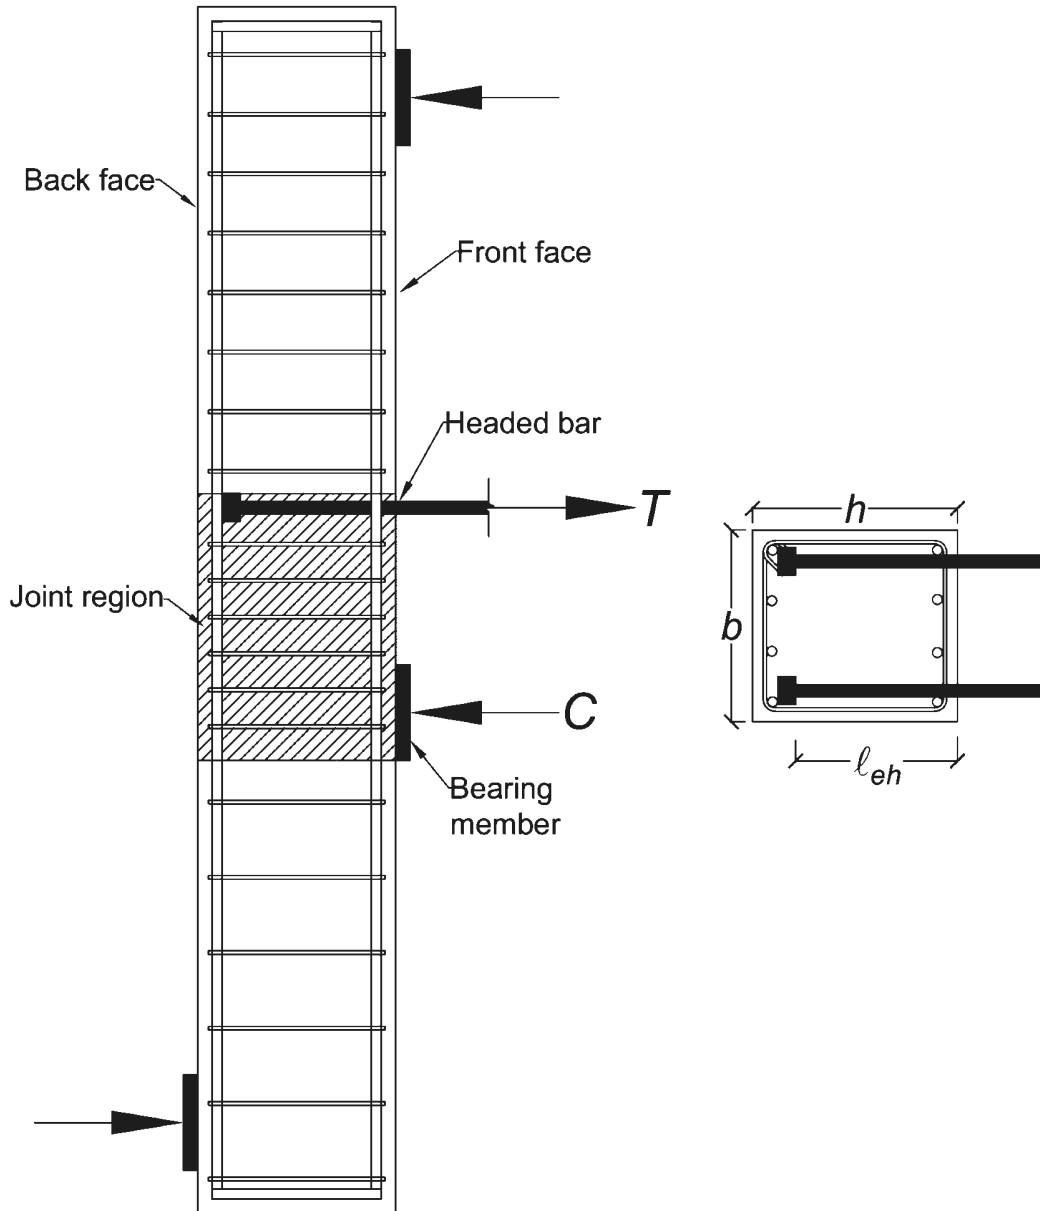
Schematic of the specimens with headed bars, side view (left) and top view (right)
